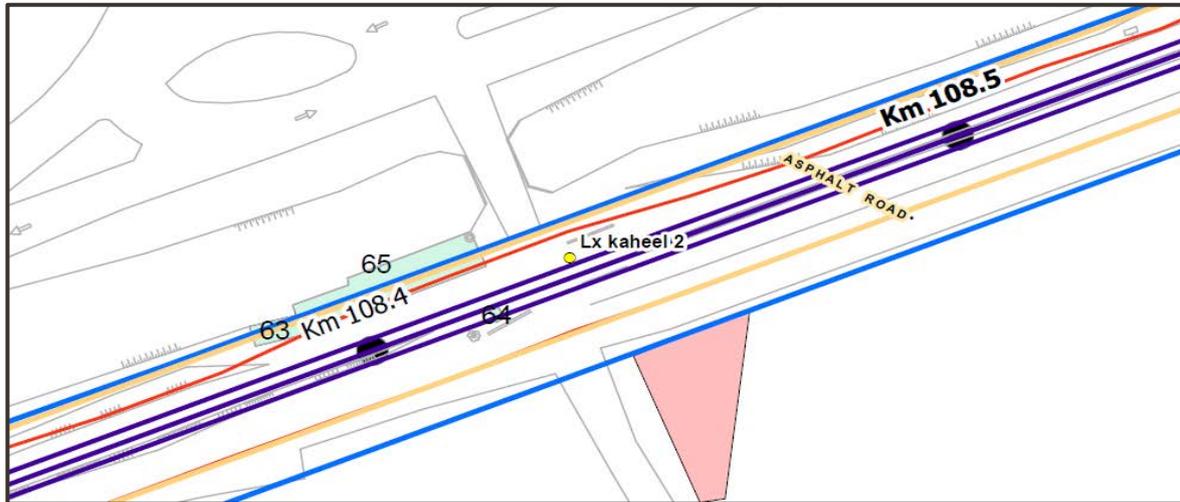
Examples of sites that overlap with ENR property and can be avoided in the final design
